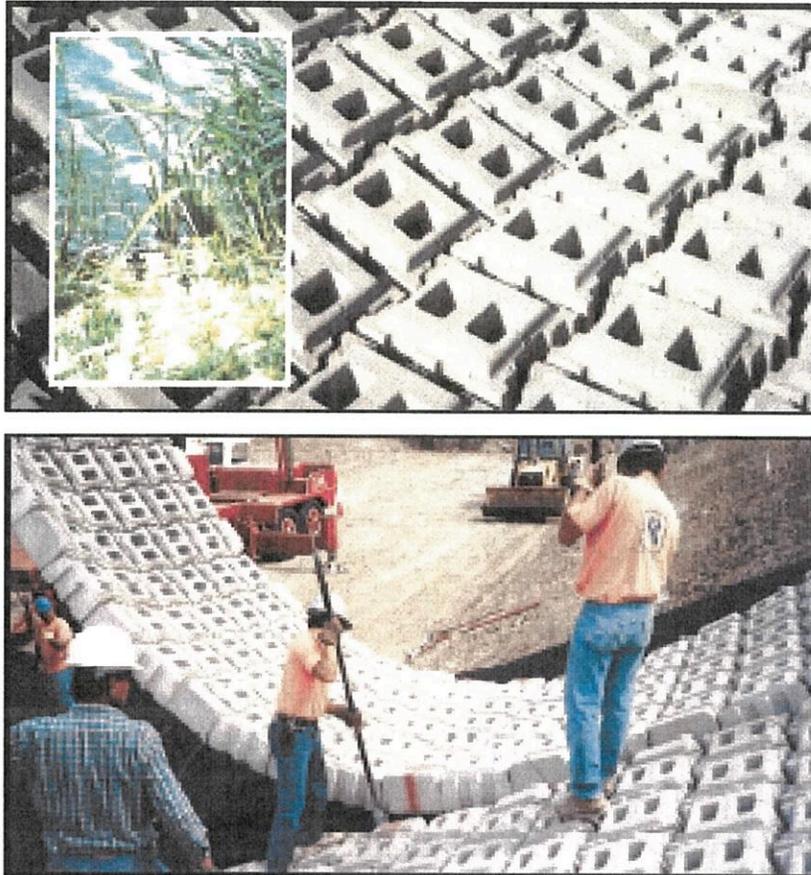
Articulated Concrete Block mattress installation, close-up details, and finished appearance
